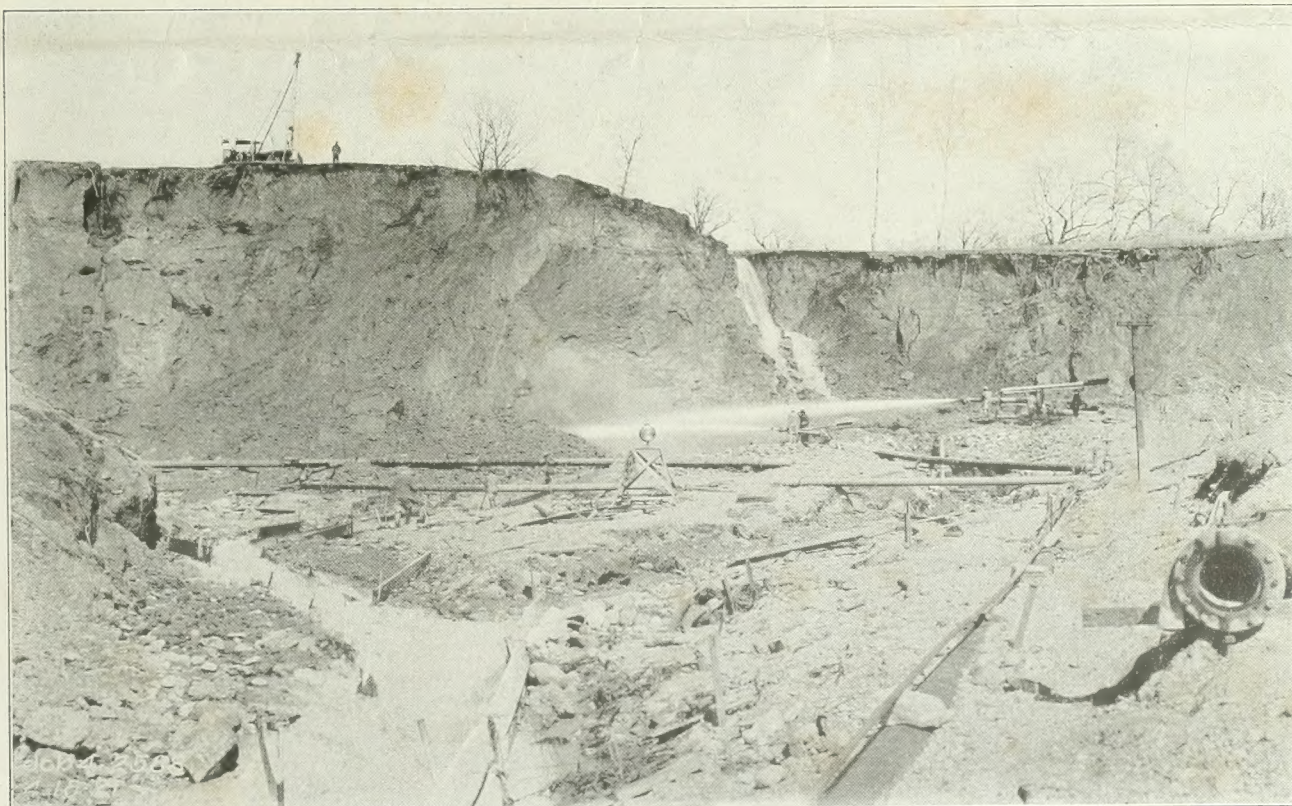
HYDRAULIC GIANTS EXCAVATING MATERIAL IN THE BORROW PIT
